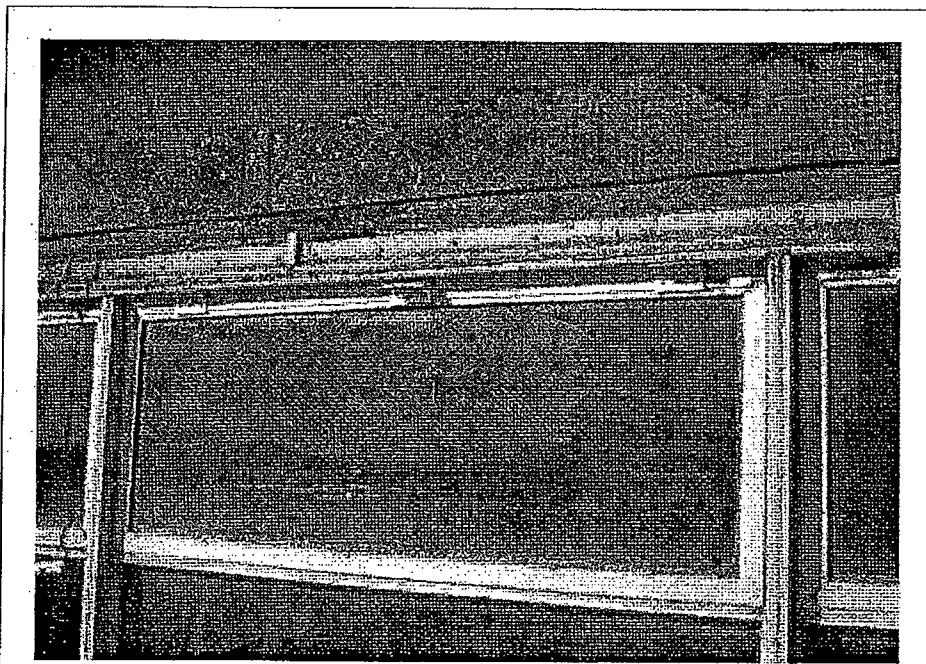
Windows and Louvres – Triple hinged sash held by only two hinges on the curtain wall tower. Note excessive use of silicone.
